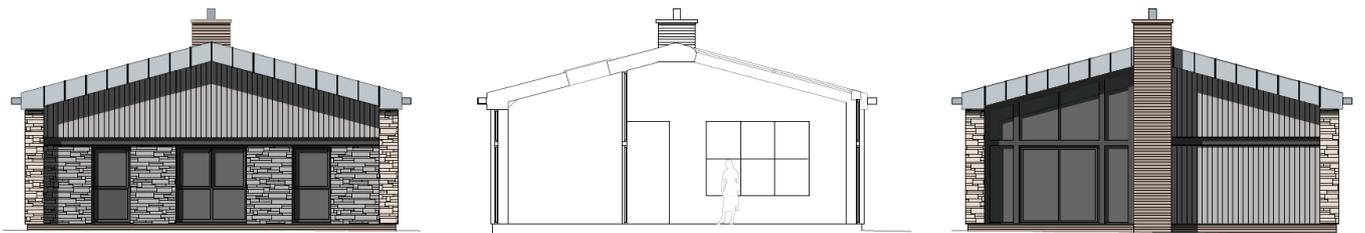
South Gable elevation (Left), Section (Centre) and North Gable elevation (Right)
